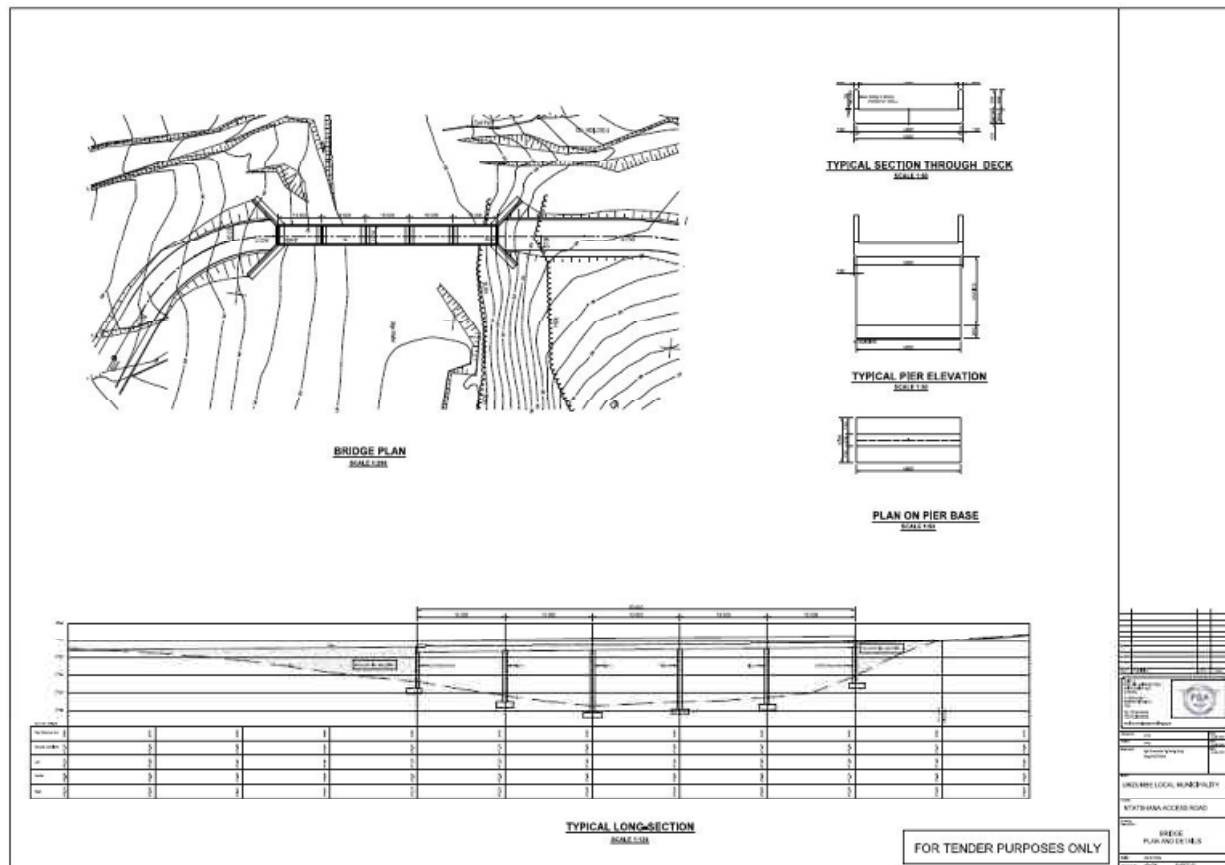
Design drawing showing the proposed bridge structure planned for the preferred route alignment option 1 crossing the Mtwalume River.
